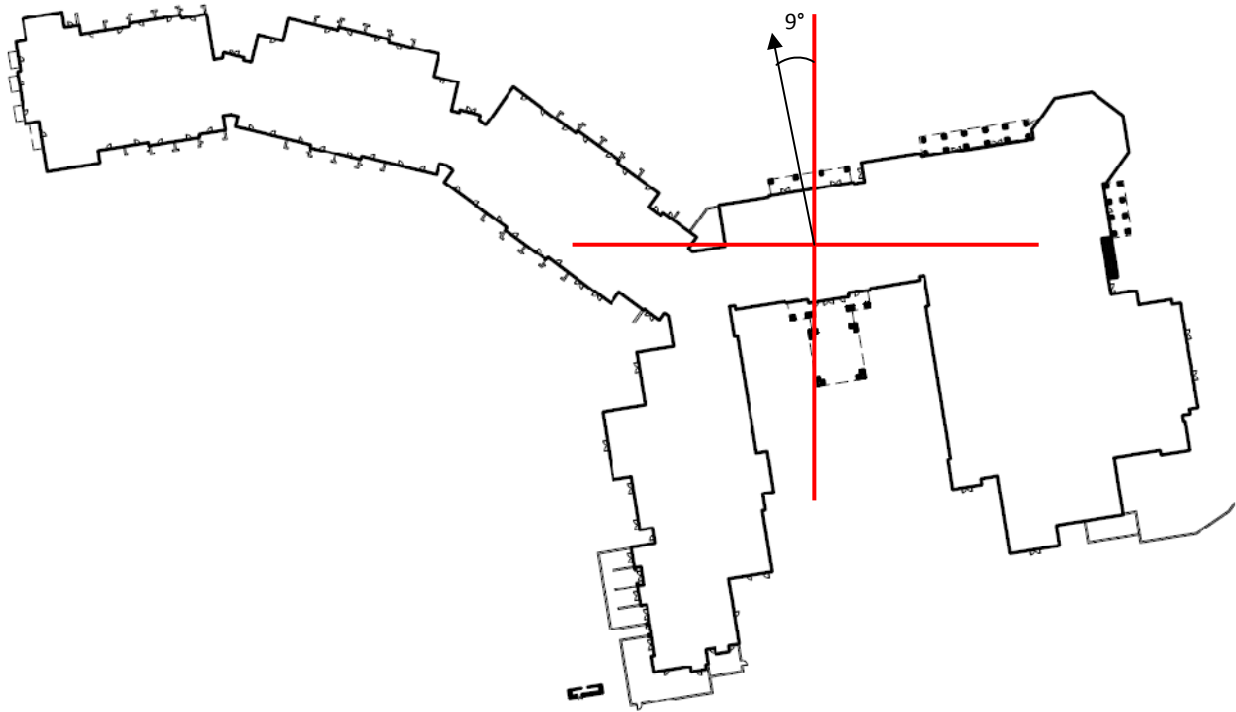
above shows that the building is oriented slightly west of north, with the Living Room north wall facing about 9 degrees west of north. With the polar north correction of 9 degrees, the glazing is facing approximately true polar north ($9^{\circ}\text{NW magnetic north} + 9^{\circ}\text{NE correction to polar north} = 0^{\circ}\text{ N}$).
